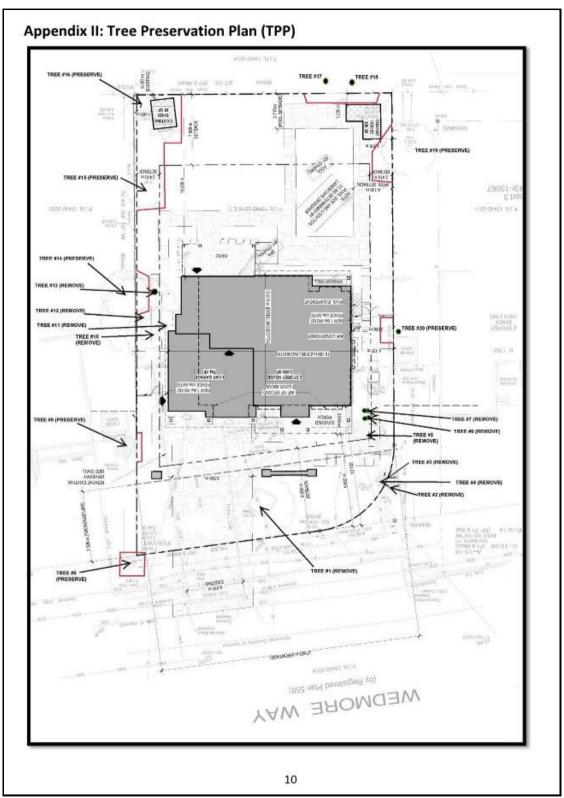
Arborist Report – Tree Preservation Plan (Glenwood Tree Service Inc. 2021)
